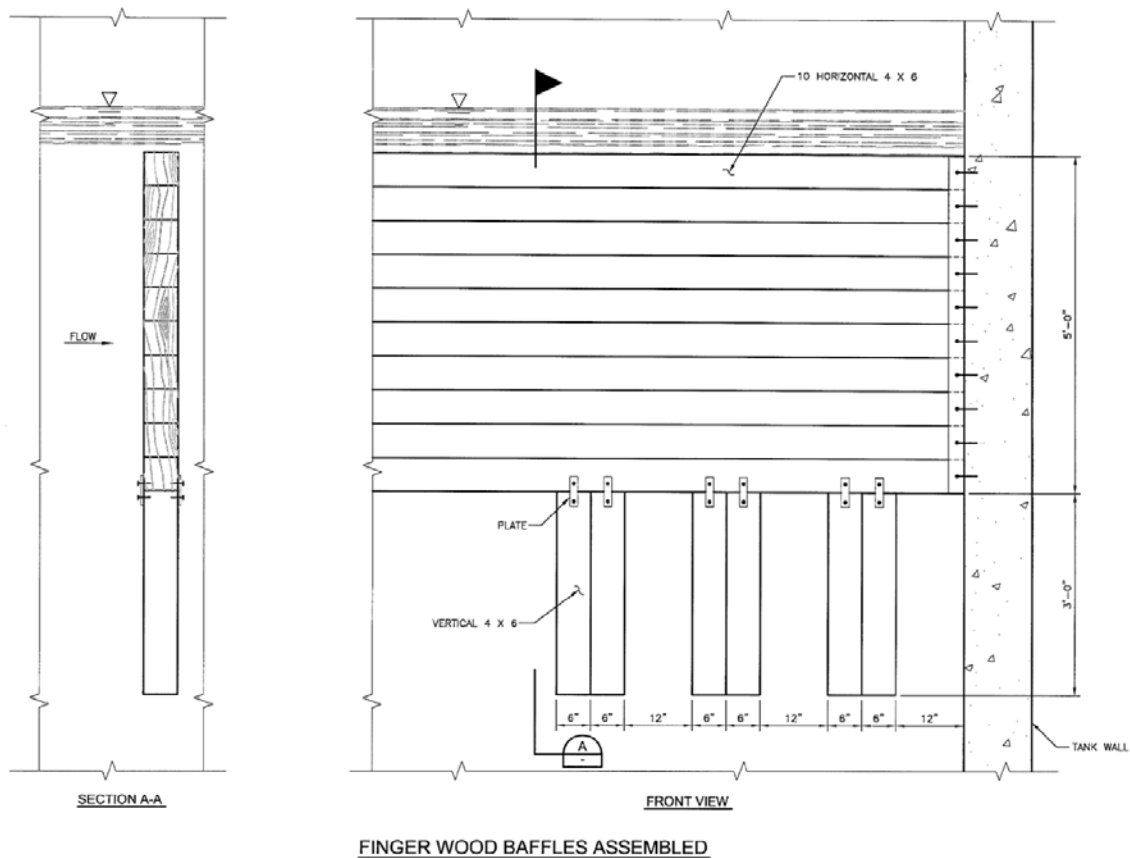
FRONT VIEW AND CROSS SECTION OF THE INLET FINGER WOOD BAFFLES
